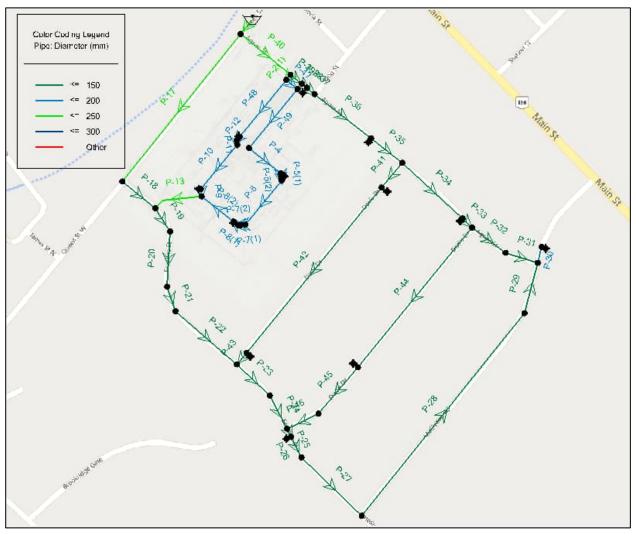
Agnes St Subdivision & Local Network Layout with Pipe IDs¹
